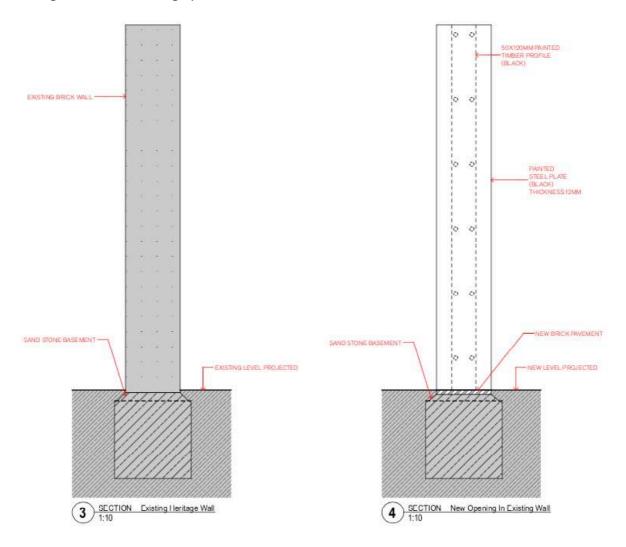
Proposed Section of existing heritage wall vs new (Source: FJMT 2019, DA-5002, SSDA01, Heritage Wall Details, 18.12.19)
